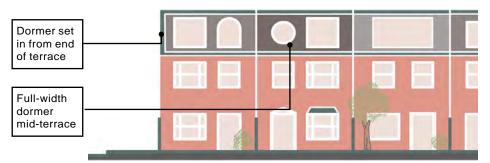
Dormers on a terraced houses that are full-width for midterrace houses, but set in from the edge of a gable end (or hipped roof) on the end of terrace house.
